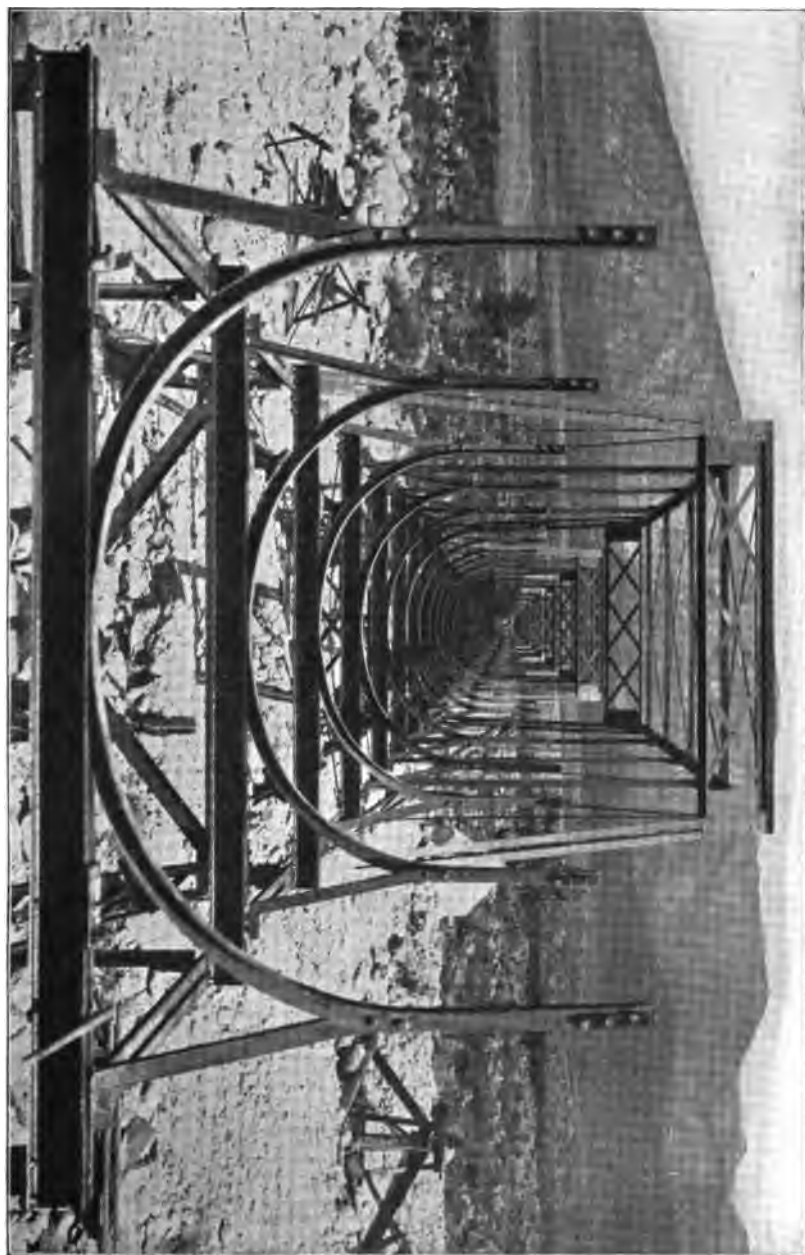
PLATE II.—Mill Creek Flume and Steel Bridge, Santa Ana Canal.
